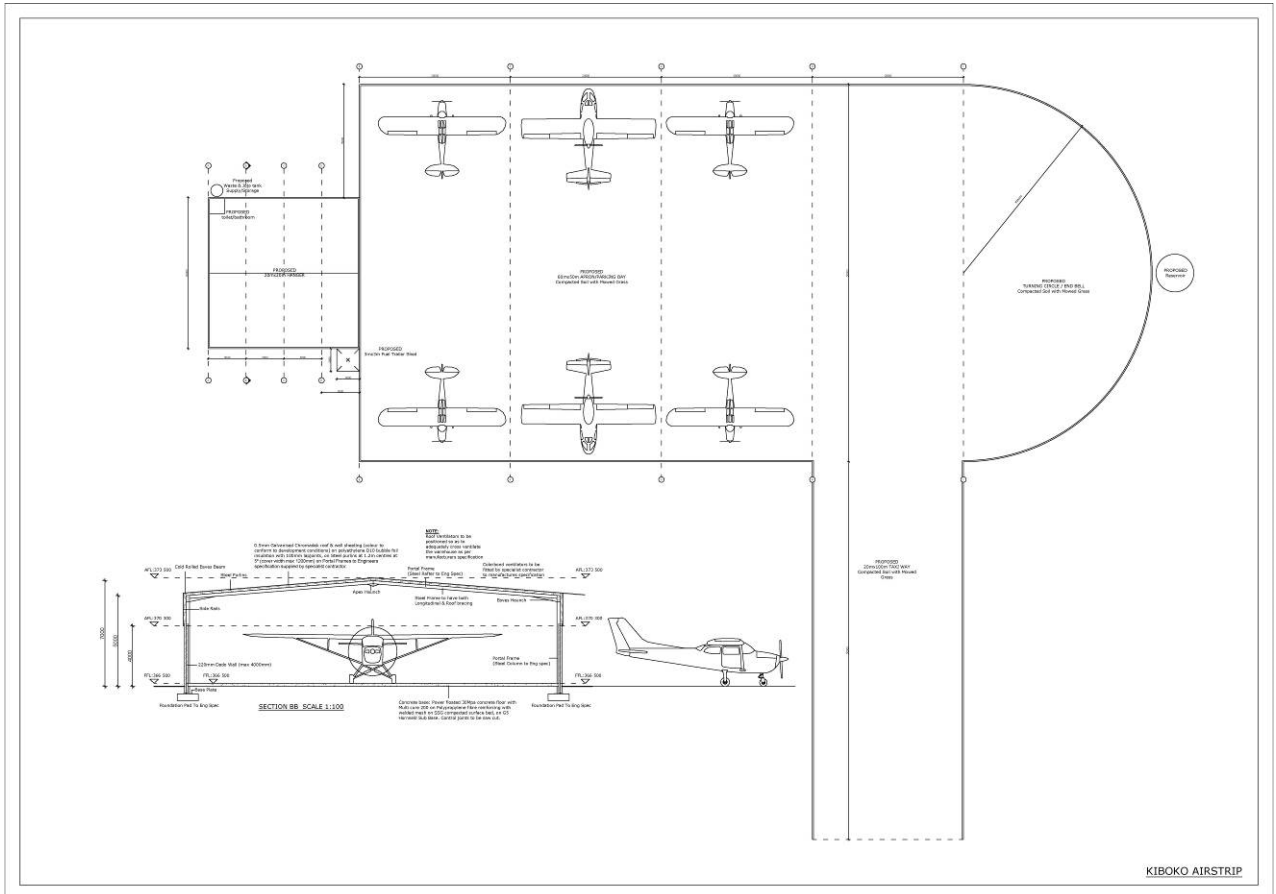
Ground floor plan of proposed hangar, apron, turning circle and water reservoir (Client).
